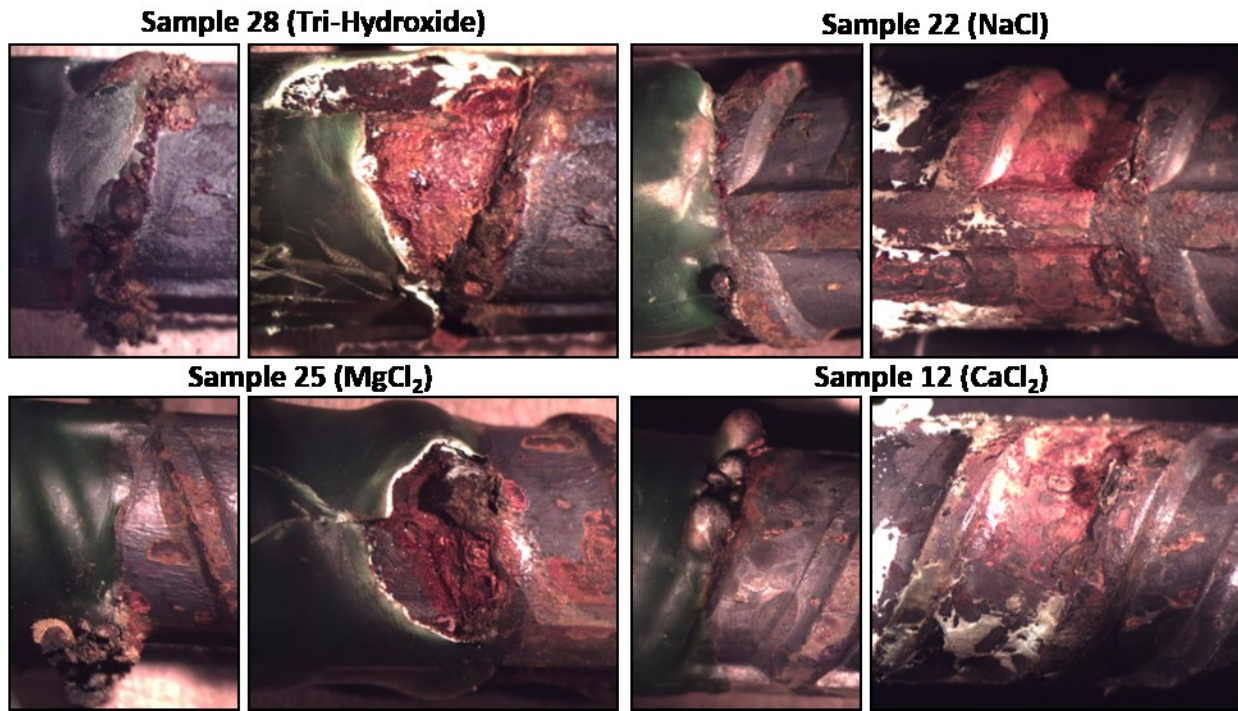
Examples of crevice corrosion on rebar specimen (before and after lacquer removal)
